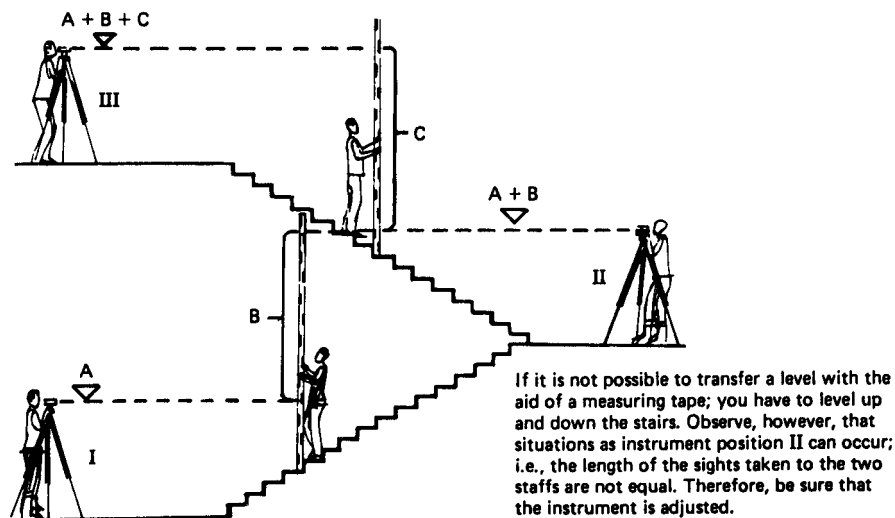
Transferring elevations in a multistory building. (Courtesy of the National Swedish Institute for Building Research, FIG Report 69)
